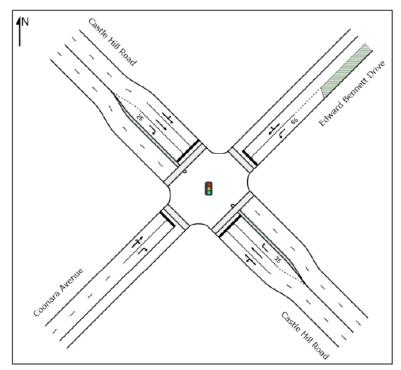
The signalised intersection of Castle Hill Road with Edward Bennett Drive and Coonara Avenue (SIDRA)
